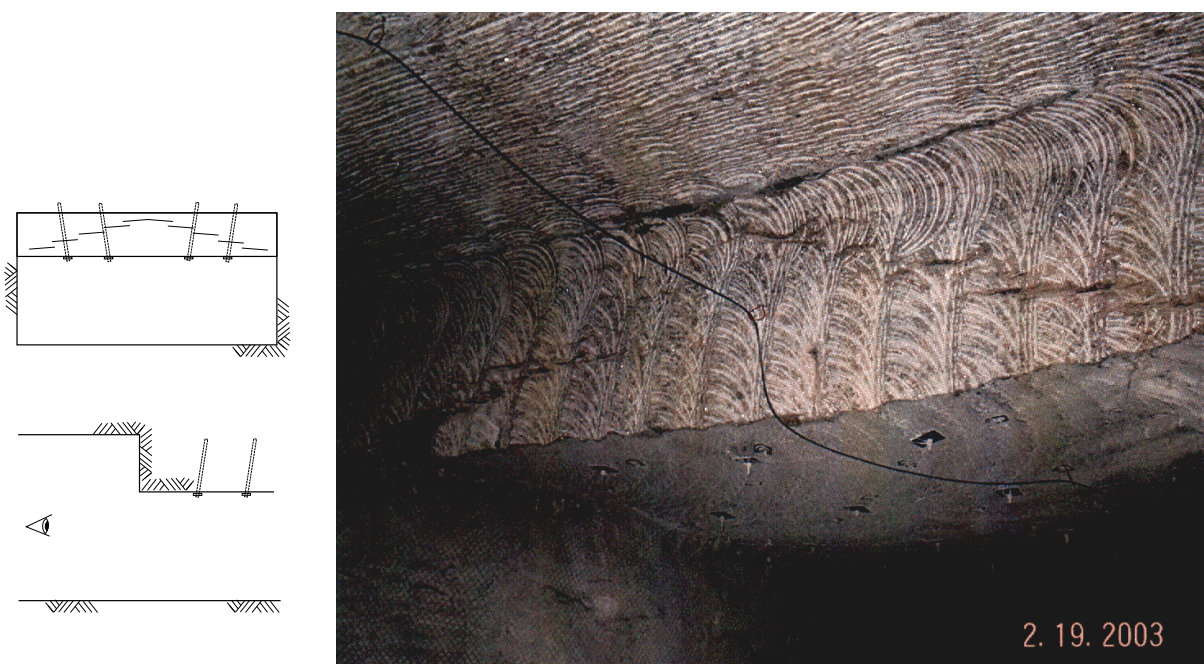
Photo of *en echelon* (large aperture sub-parallel) fracturing at change in roof elevation at WIPP (Hansen, 2003), with orientation drawings at left illustrating roof geometry and rockbolts.
